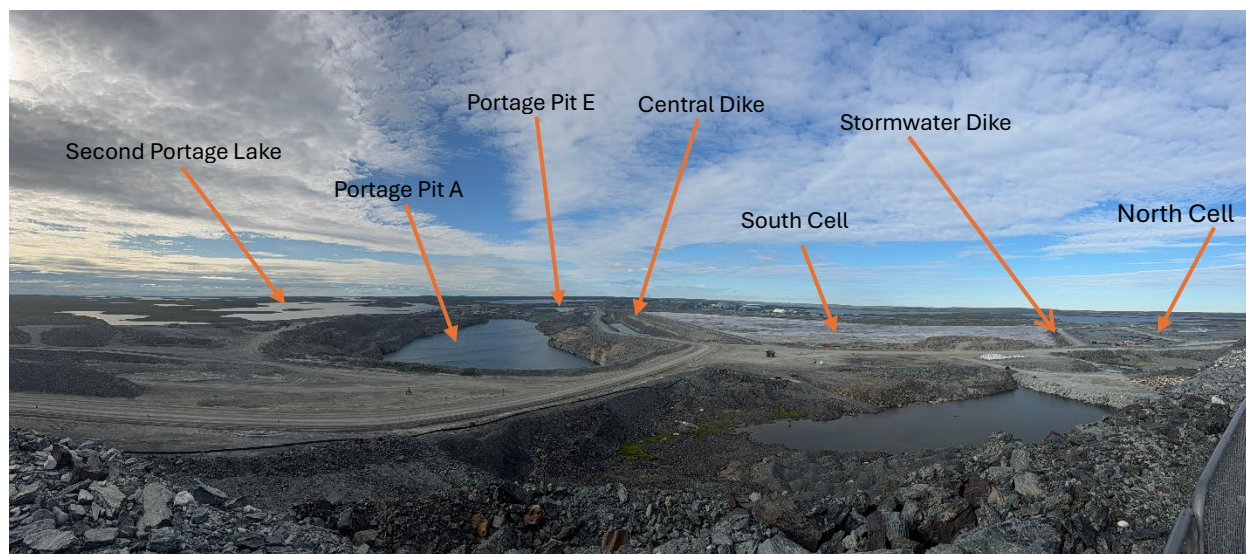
Panoramic view of Meadowbank Site from Portage Rock Storage Facility, facing south
